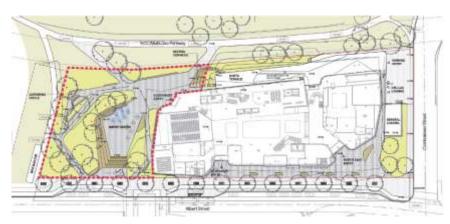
Landscape plan, February 2020. Source: Diamond Schmitt Architects, PPS Studio, JDRP Presentation.
